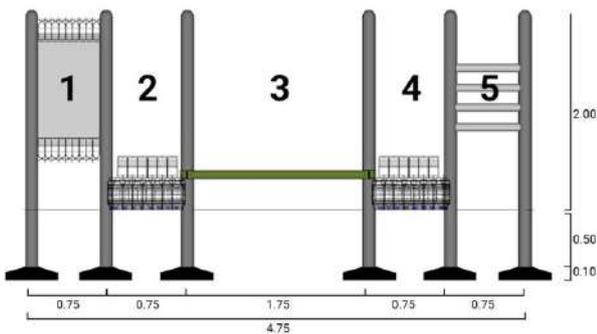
The playground facility design at RW 07 ecobrick bench
